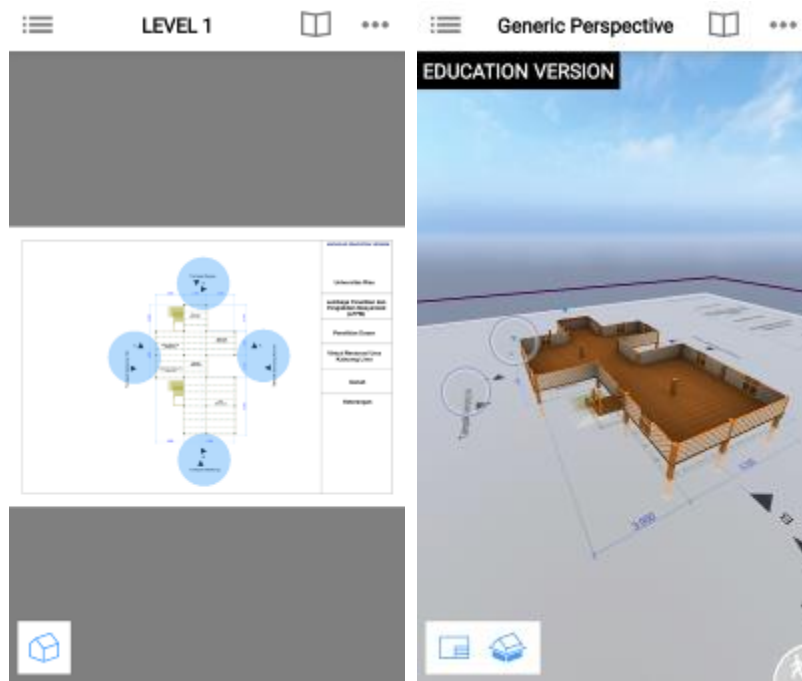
(Left) 2D. Figure Plan Image View. 11. (Right) 2D integration image view and 3D Floor plan
